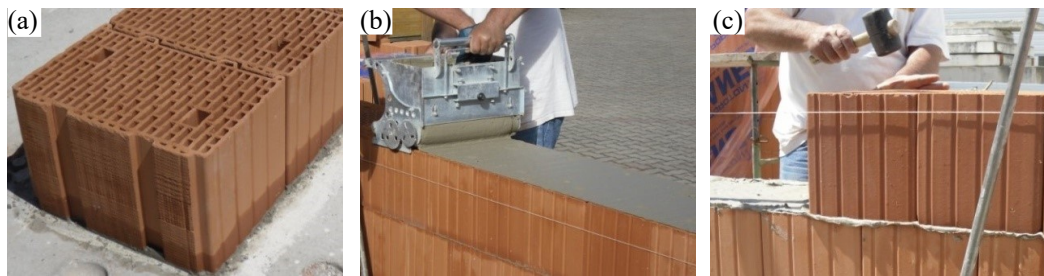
a) “tongue and groove” units, b) execution of the thin layer bed joints and c) construction of the wall masonry (adapted from Morandi et al. (2021))
